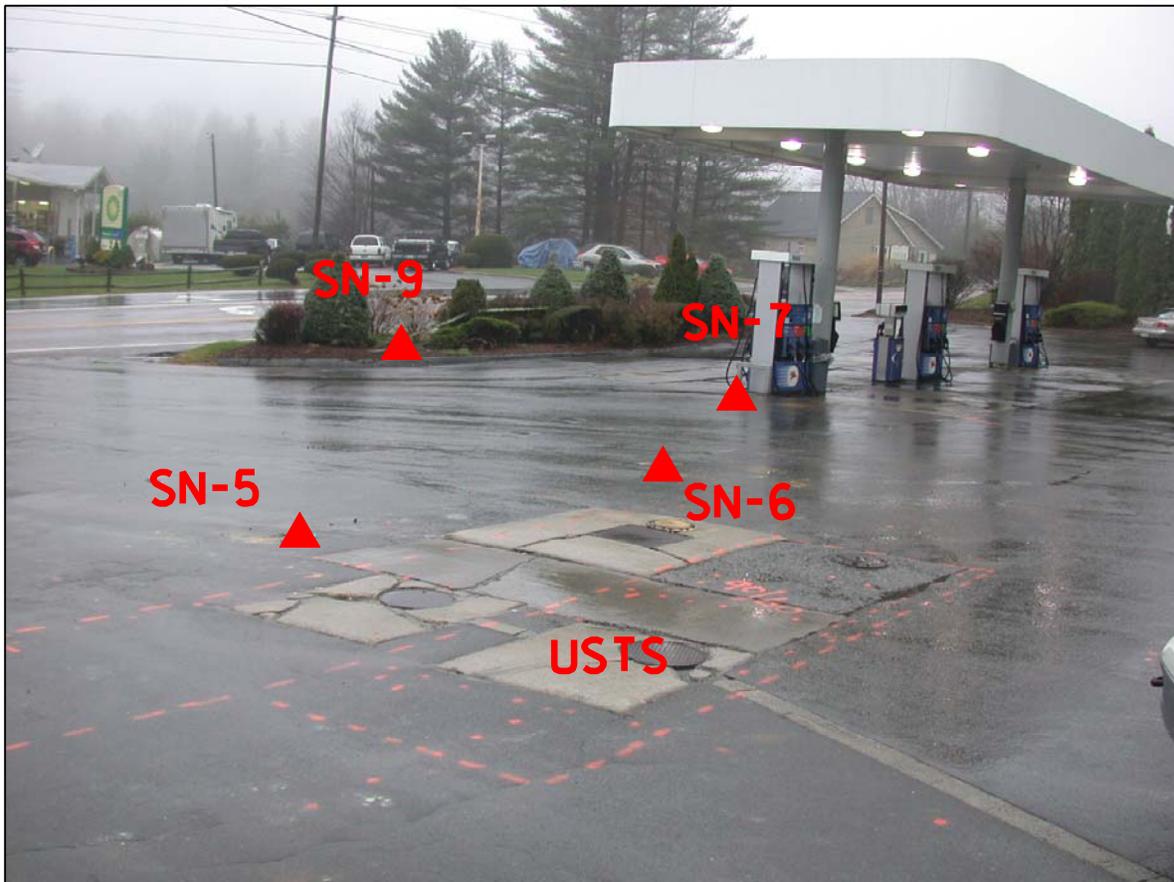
BORINGS AT USTS AND PUMP ISLAND LOOKING NORTHWEST
